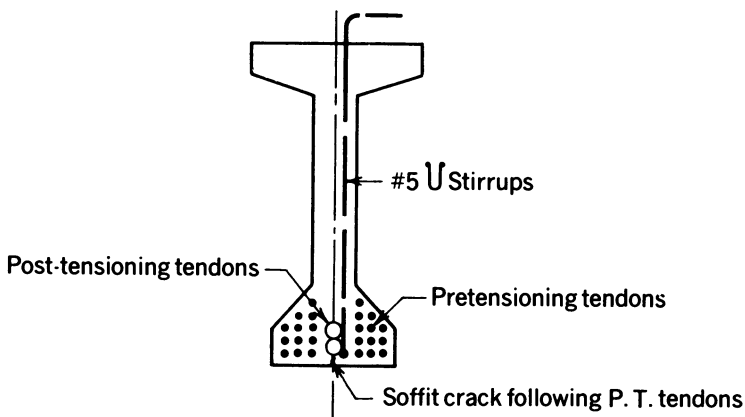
Beam with combined pretensioned and post-tensioned tendons and a crack in the soffit.
